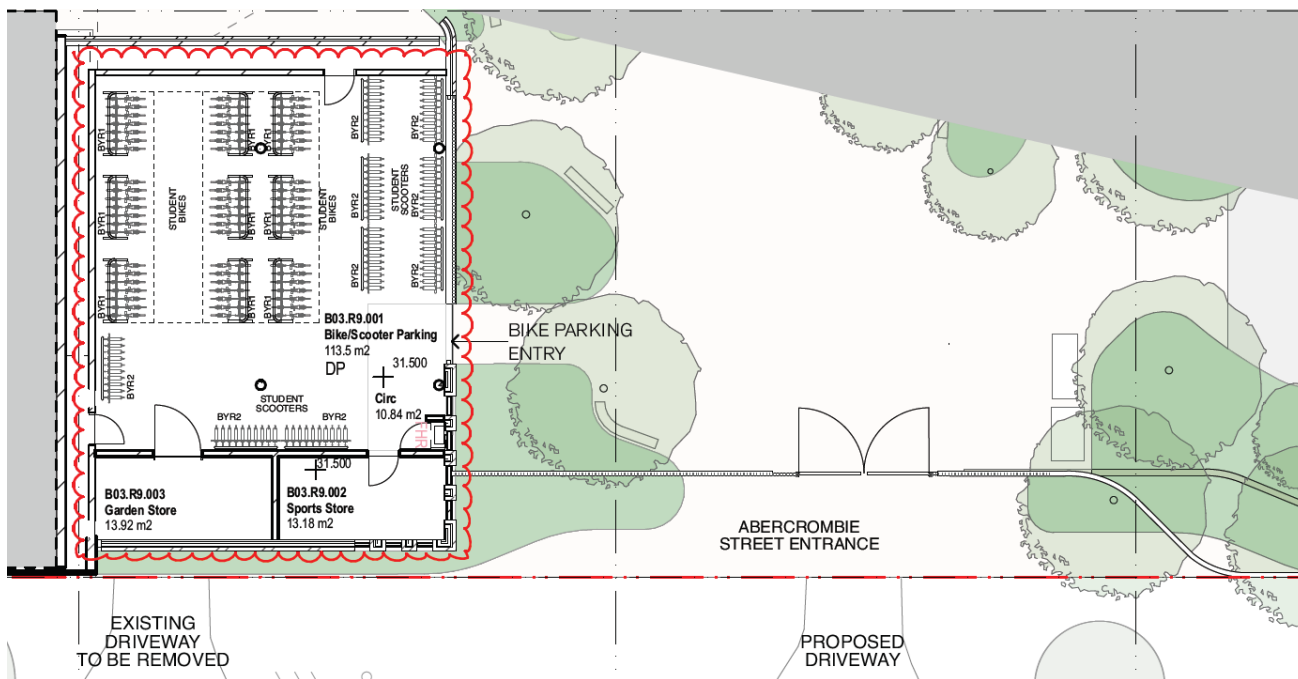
Amended Student Bicycle and Scooter Parking Layout
